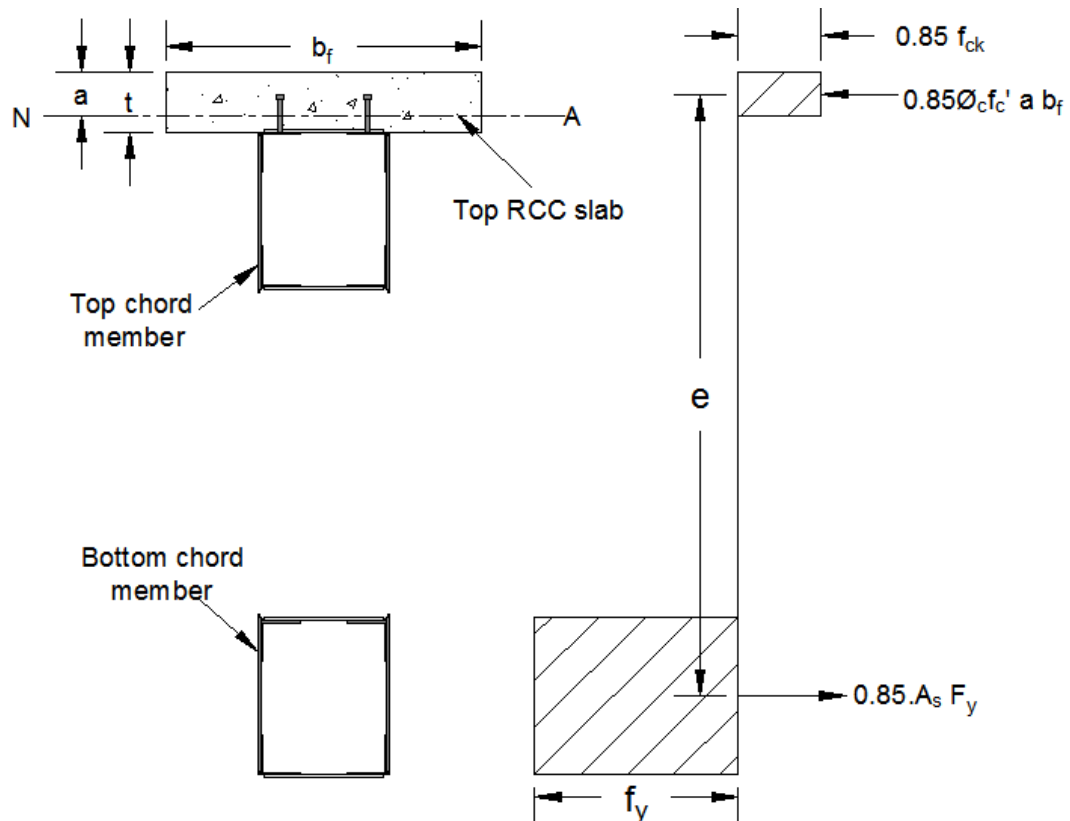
Force equilibrium of composite truss (CAN/CSA S16.1)
